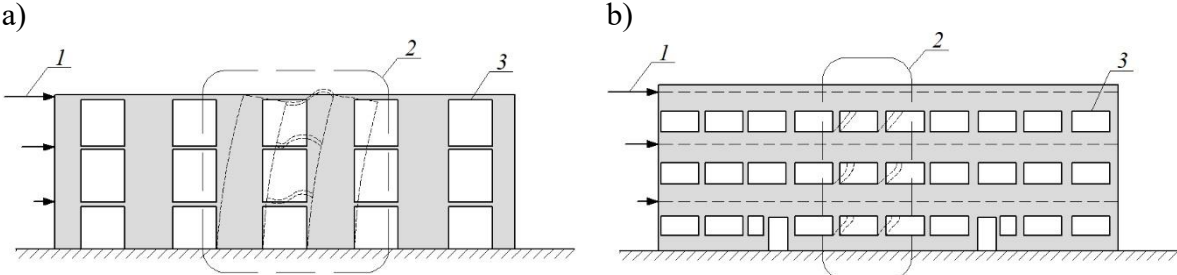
Relative rigidities of piers and spandrels [N21]: a) rigid piers and flexible spandrel, b) flexible piers and rigid spandrel: 1 – horizontal force, 2 – the deflected shape of the building, 3 – opening
